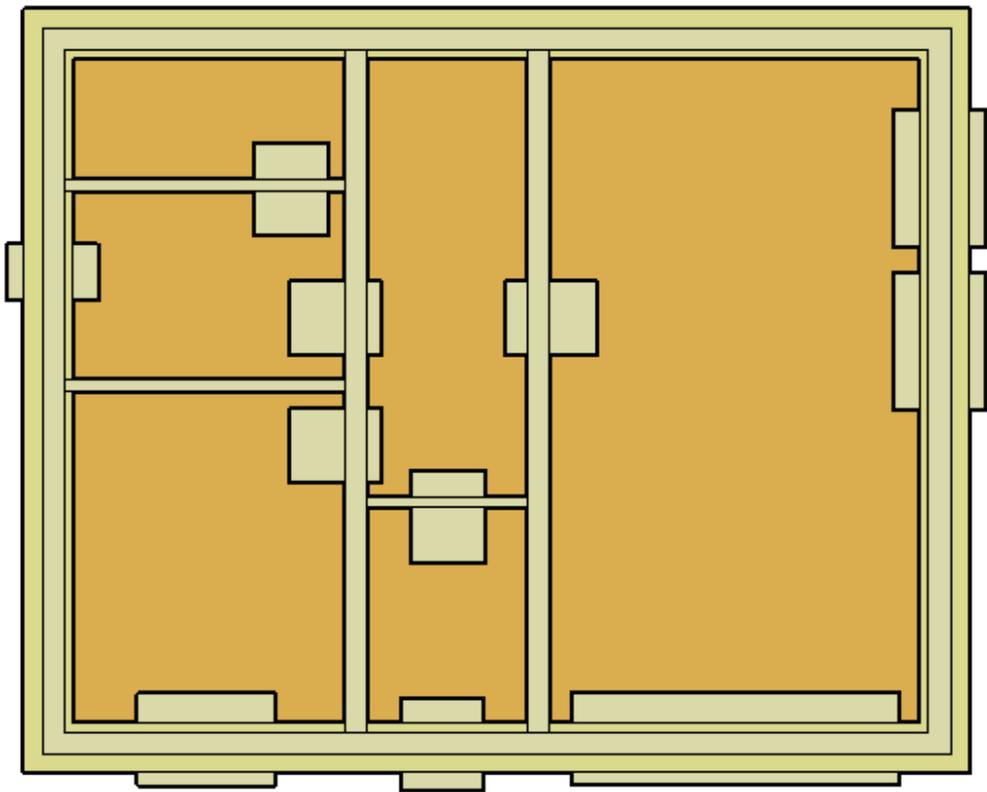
Projection of the building with prepared cuboids necessary to create windows and door gaps
